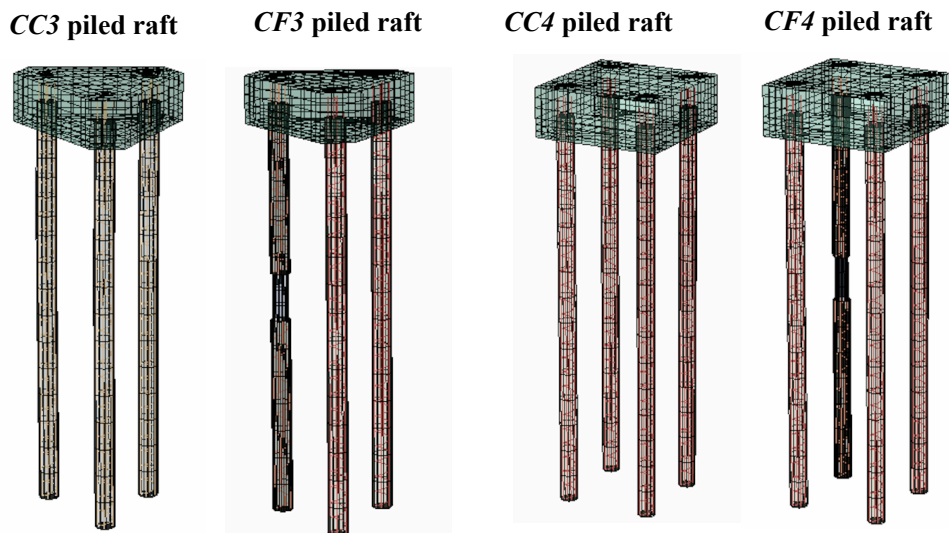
Rebar placed inside *CC3*, *CF3*, *CC4* and *CF4* piled rafts.
